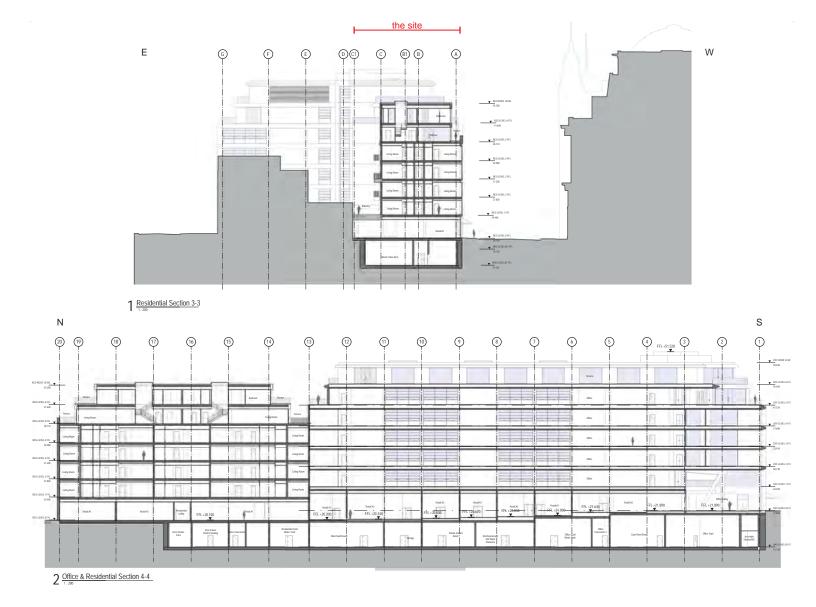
North facing section 3-3 through the northern end of the proposed building and west facing section, 4-4, showing the proposed depth of the basement (Foster & Partners, dwg. no. A-P-053-xx-002, rev. 01, date 28/08/2019)
